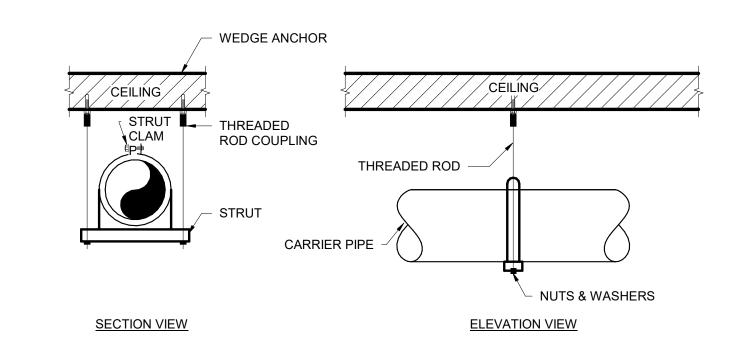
DETAILS ARE TYP THRUST BRACING METHODS, & NOT INCLUSIVE OF ALL SITE CONDITIONS. CONTRACTOR TO PROVIDE SHOP DRAWINGS OF BRACING METHODS FOR APPROVAL.
